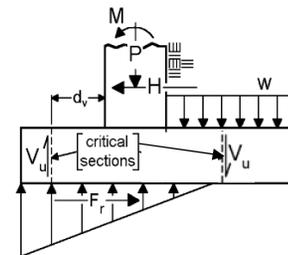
Example of Critical Section for Shear in Footings
